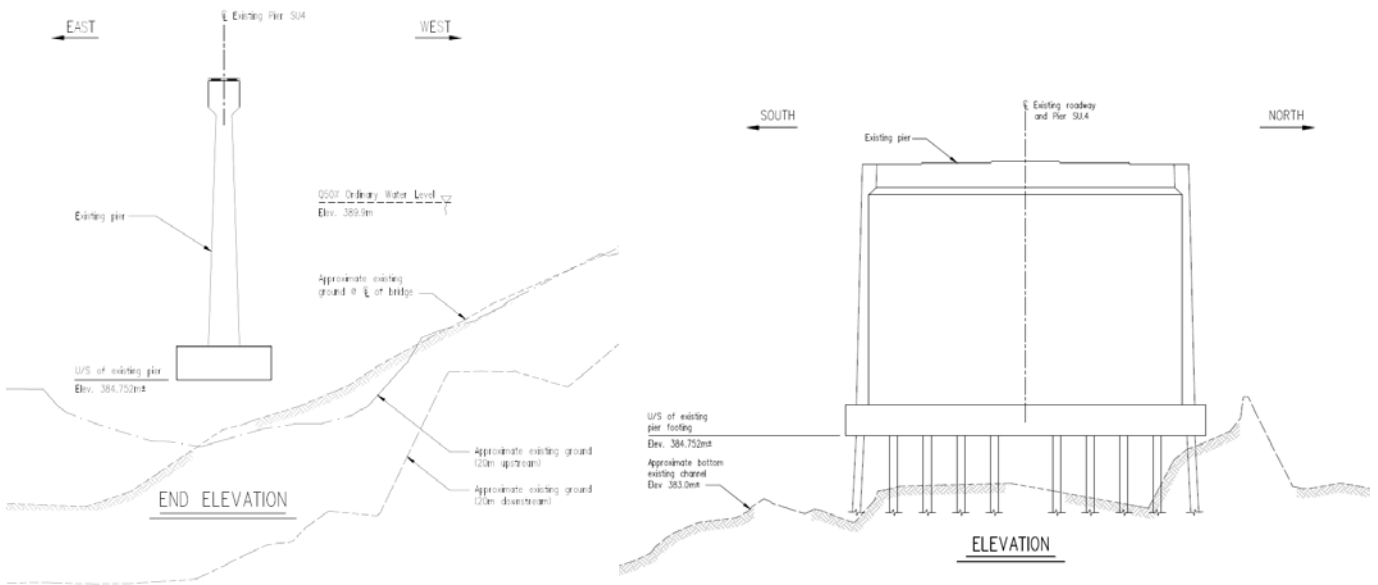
Section of Pier SU.4, Showing Depth of Scour
